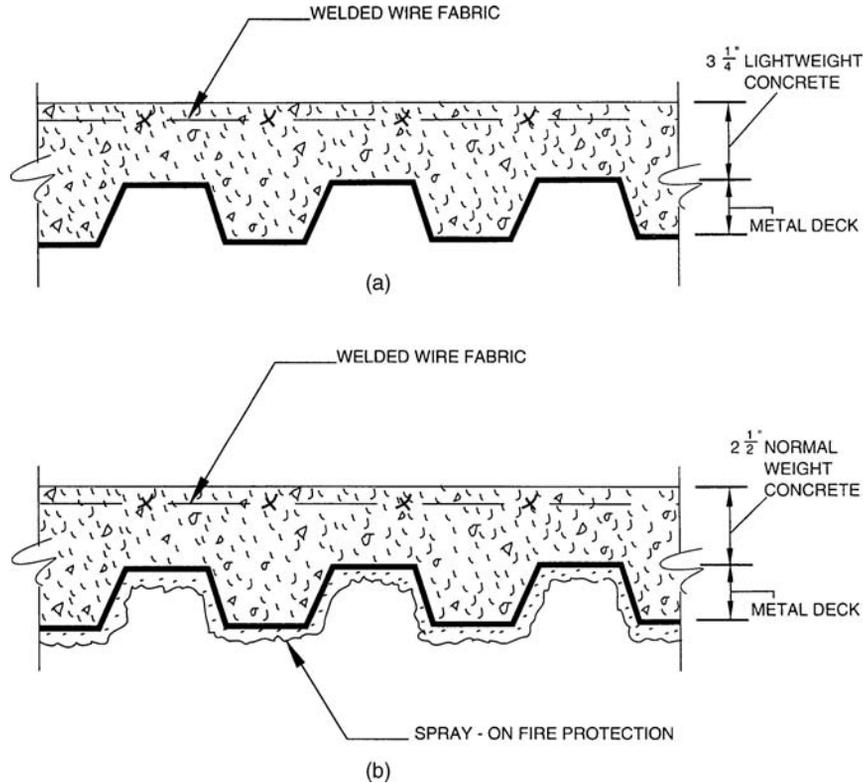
Two-hour fire-rated floor systems, with cold-formed steel deck. (a) With lightweight concrete fill; (b) with normal-weight concrete fill.
